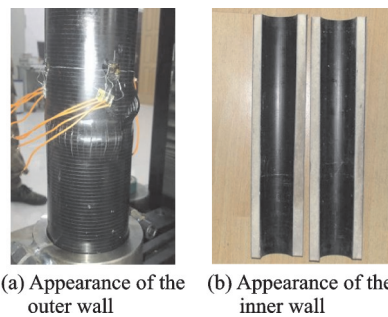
Local layered buckling of GFRP-foam sandwich pipe
